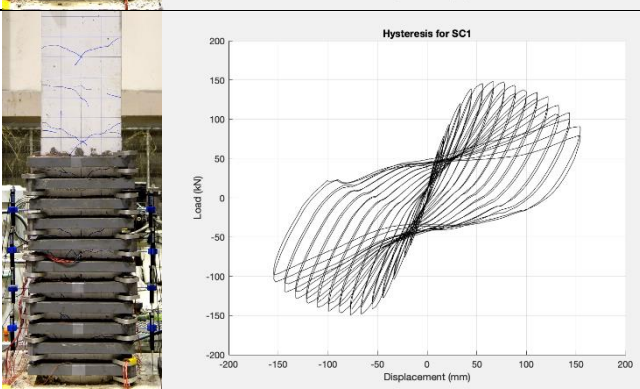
Flexural joint failure of strengthening lap-splice column SC1
